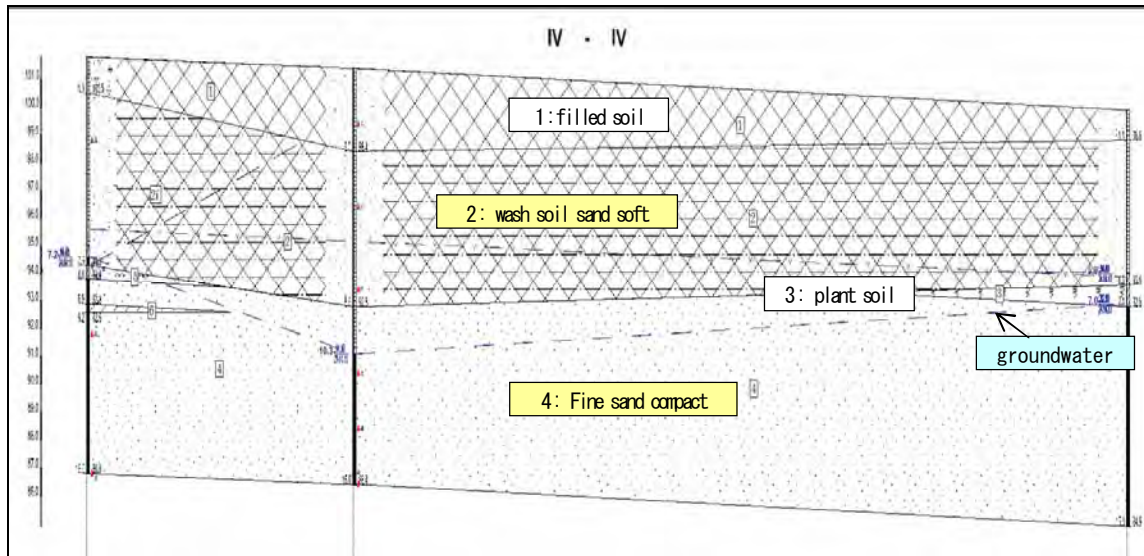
Section Plan IV-VI (Construction Site of Pretreatment/Reactor for Block 1)
